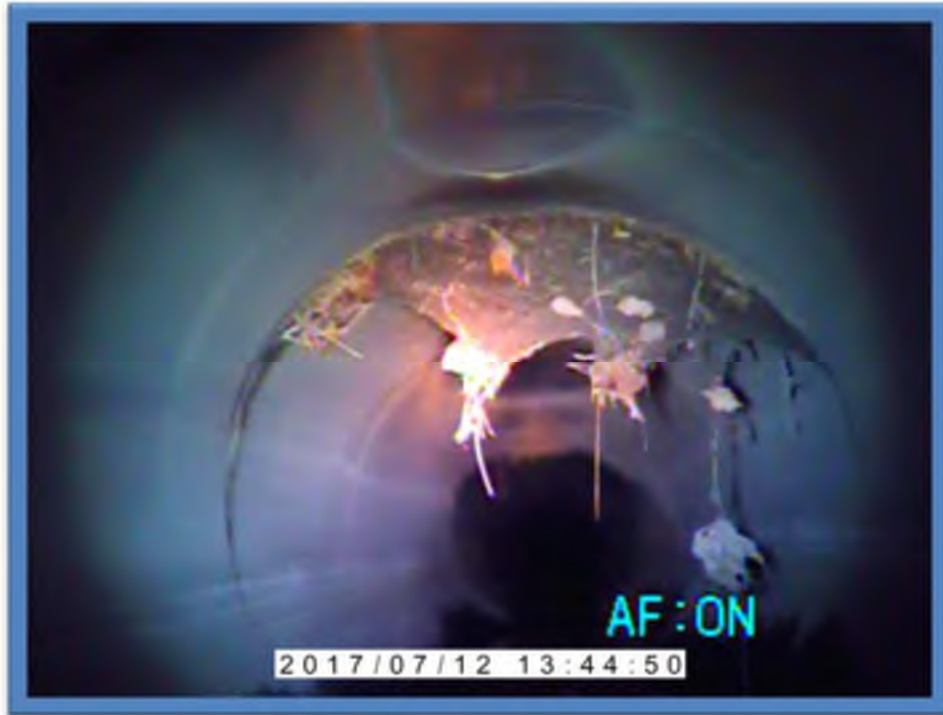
Holes in crown of pipe between 10 and 2 o'clock
